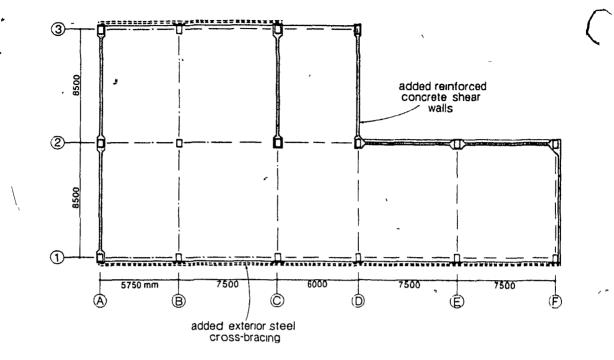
Plan View of Nine-Storey Structure Located at 80 Liverpool in Mexico City.
